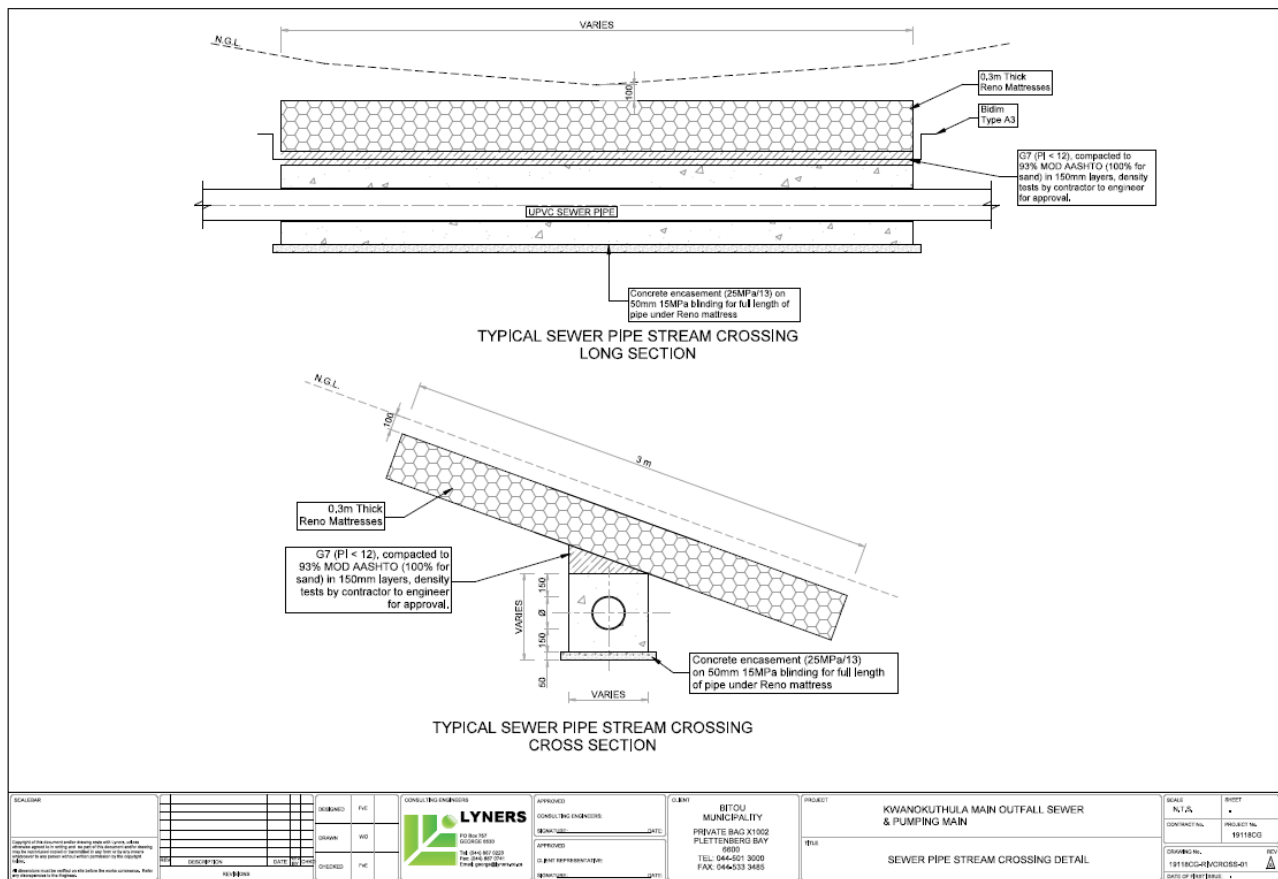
Typical stream crossing detail (Lyners Consulting Engineers, 2025)
